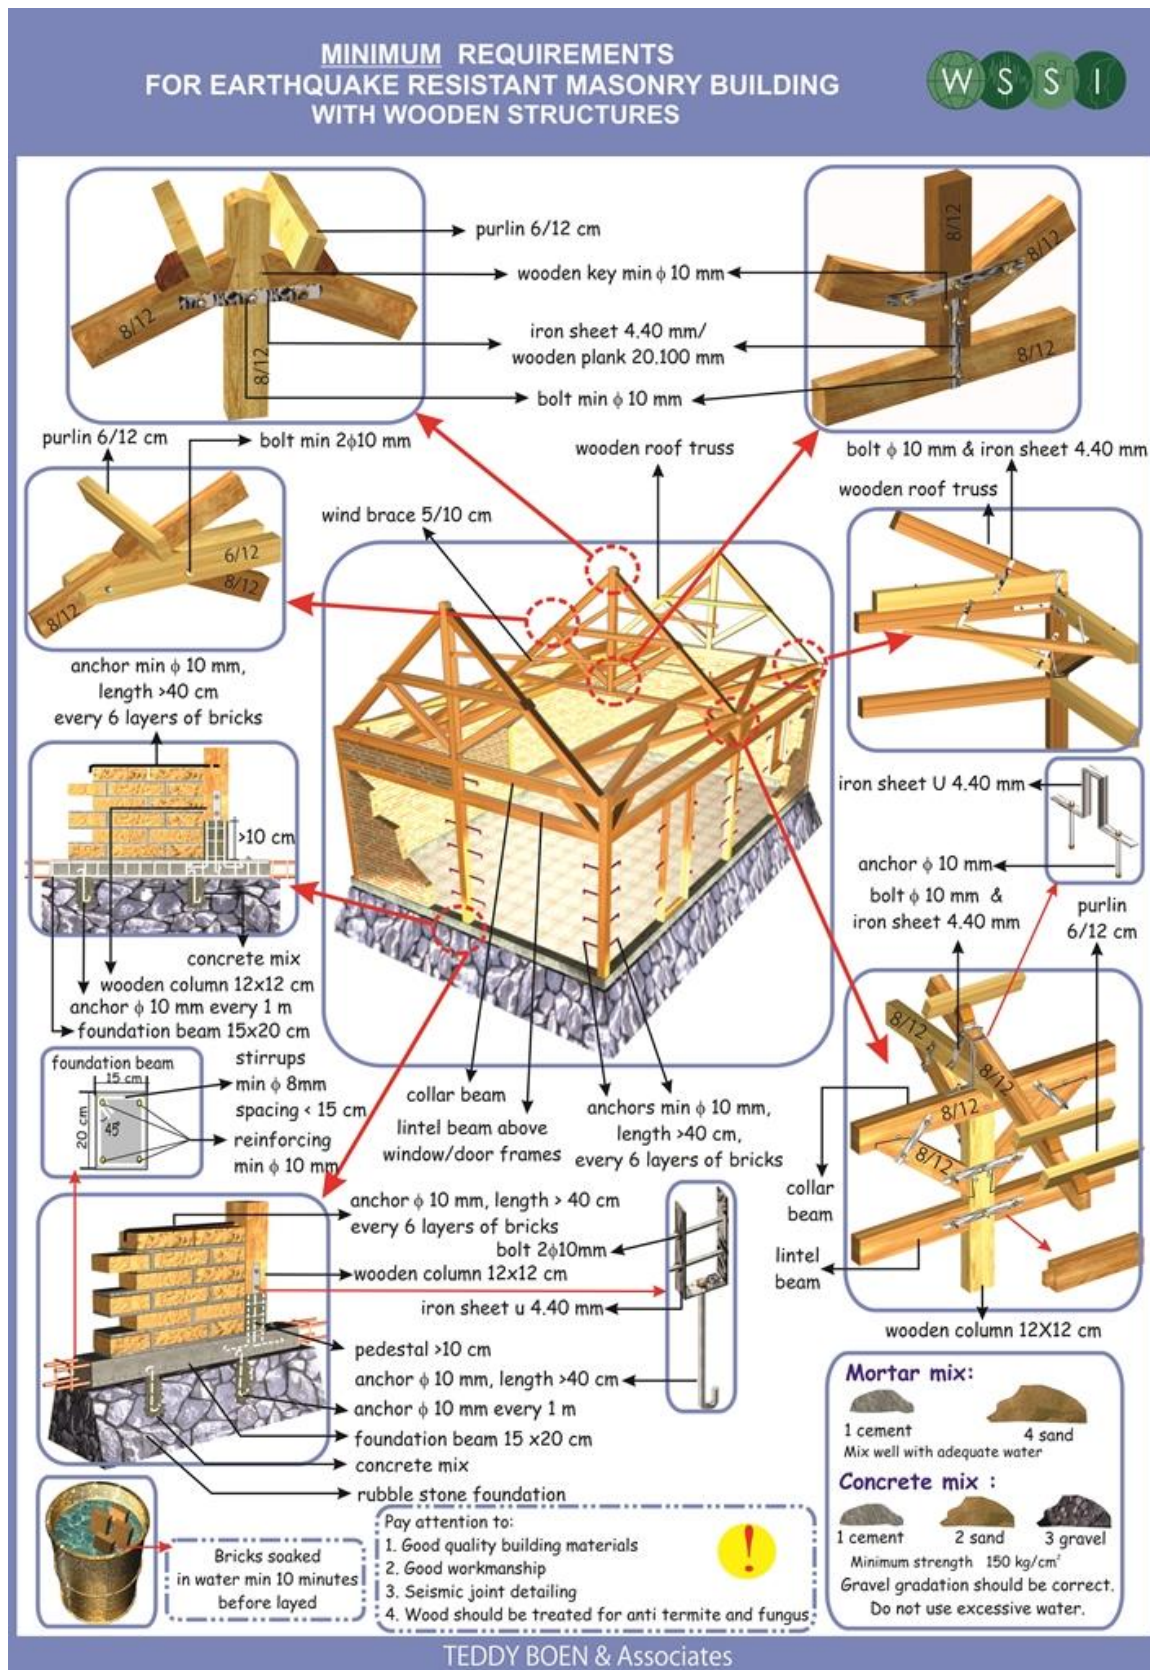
Poster Minimum Requirements for Earthquake Resistant Masonry Buildings Confined with Timber Columns and Beams
